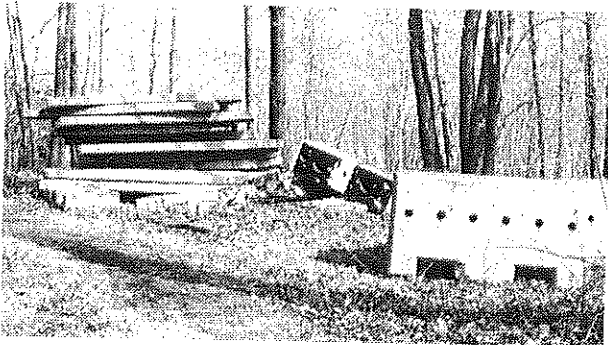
Concrete Slabs north of the Multiple Failure Building
